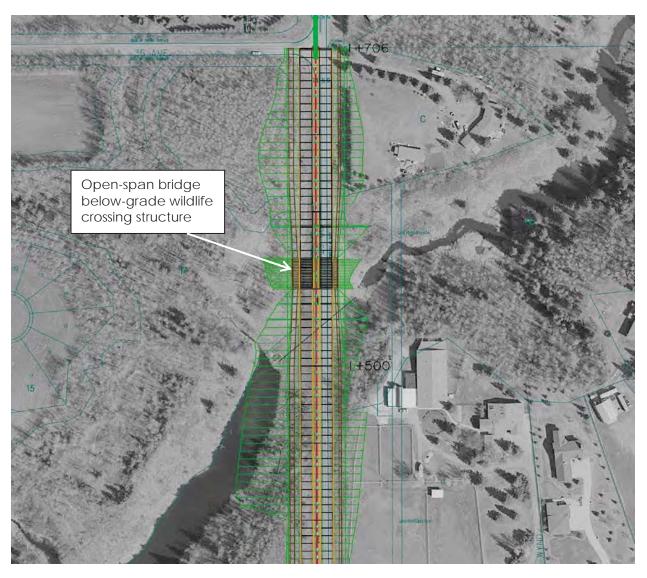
Proposed Location of the Open-Span Wildlife Crossing Structure at Wedgewood Creek
